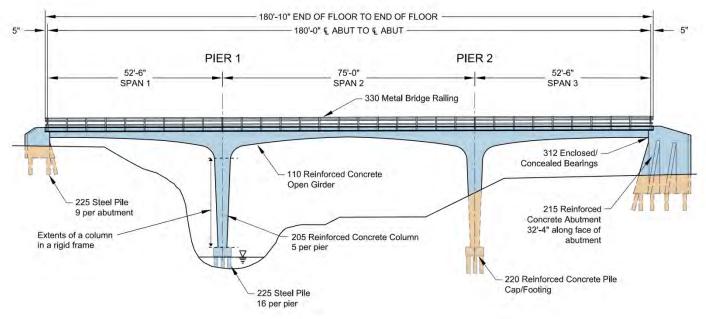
EI.24.4- 1: Elevation view of concrete rigid frame
